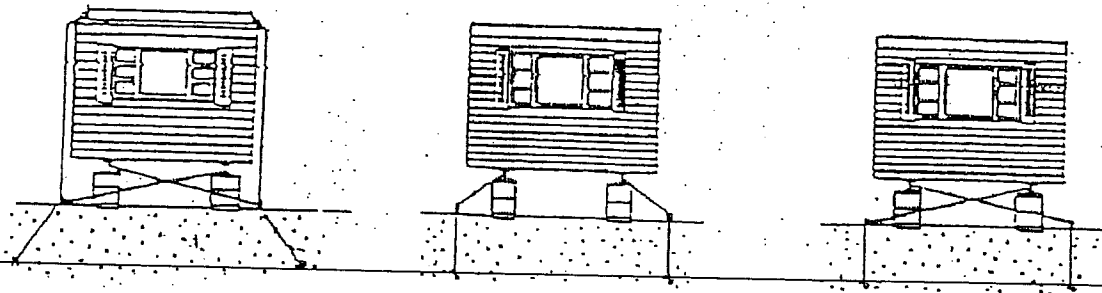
(b) For piers exceeding 80 inch in height the concrete blocks should be filled with concrete grouting and steel reinforcing rods utilized.
